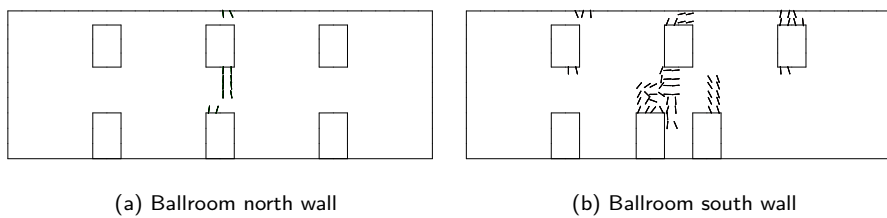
Model crack pattern, tunnel excavation completed, $V_L = 1.5\%$, upper floors.
